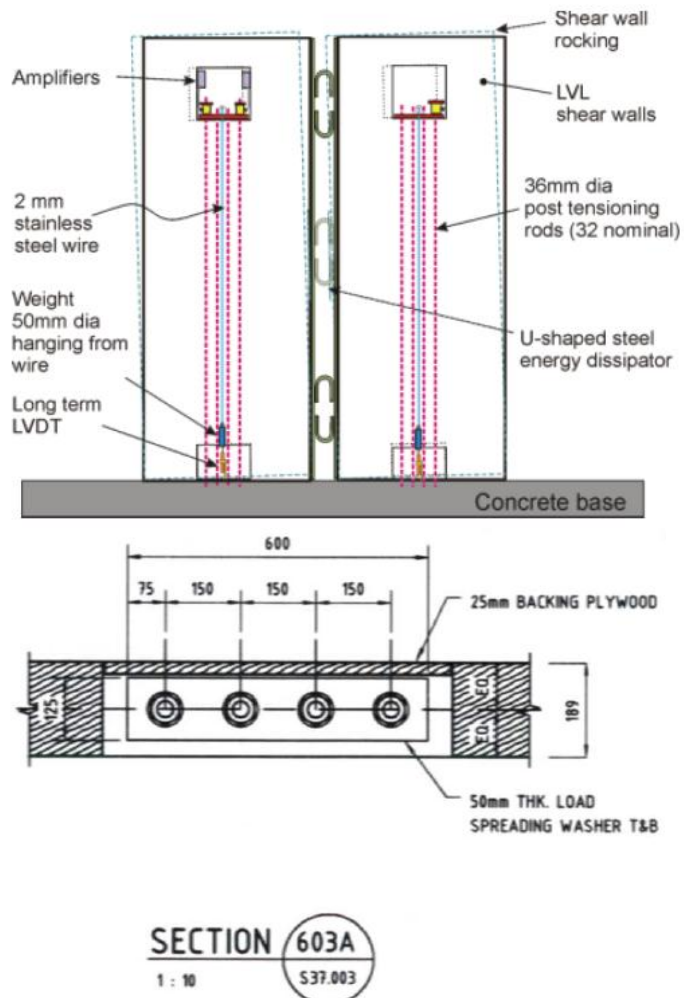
Post-tensioned shear walls in the NMIT Arts Building
